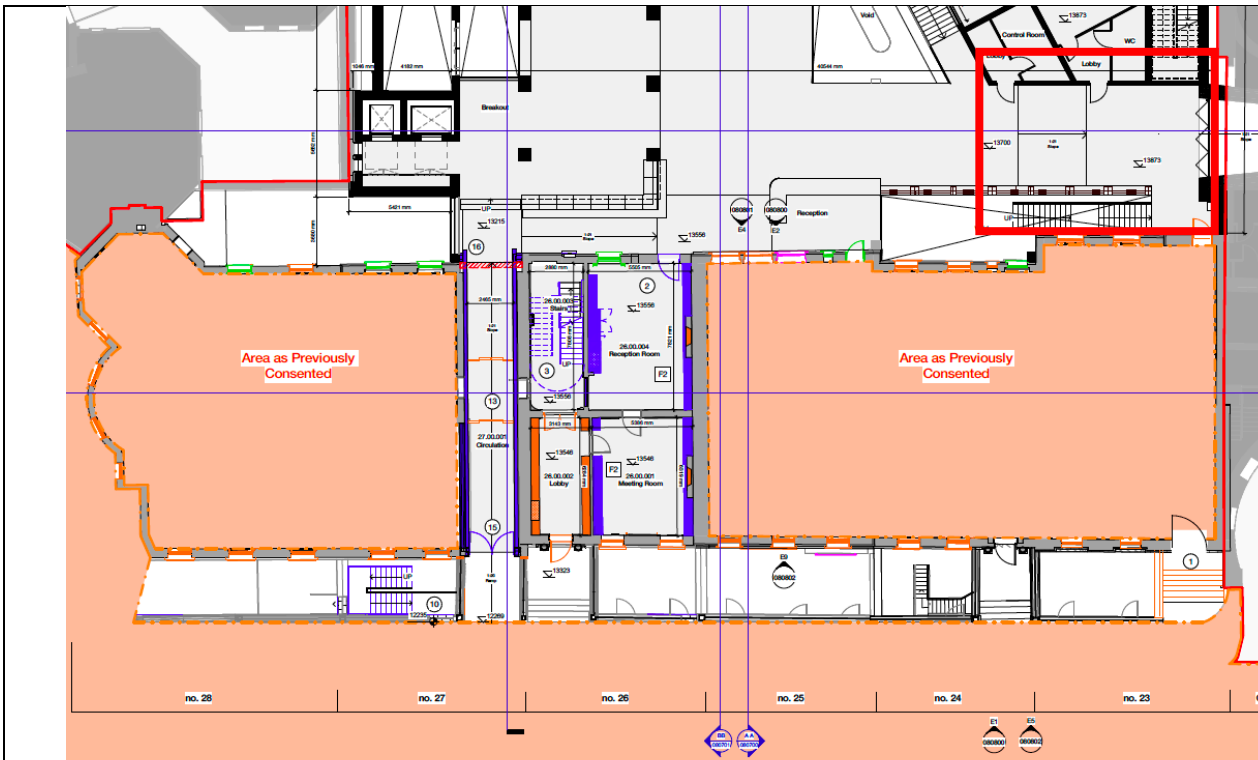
Partial proposed ground floor of New Parnell Library showing new link connection to the east directly into the new building -not through Georgian terrace no.23. (Source: S146B application, HB drawing ref: PSL-HBA-NL-RF-DR-A-080606. Rev P02)
